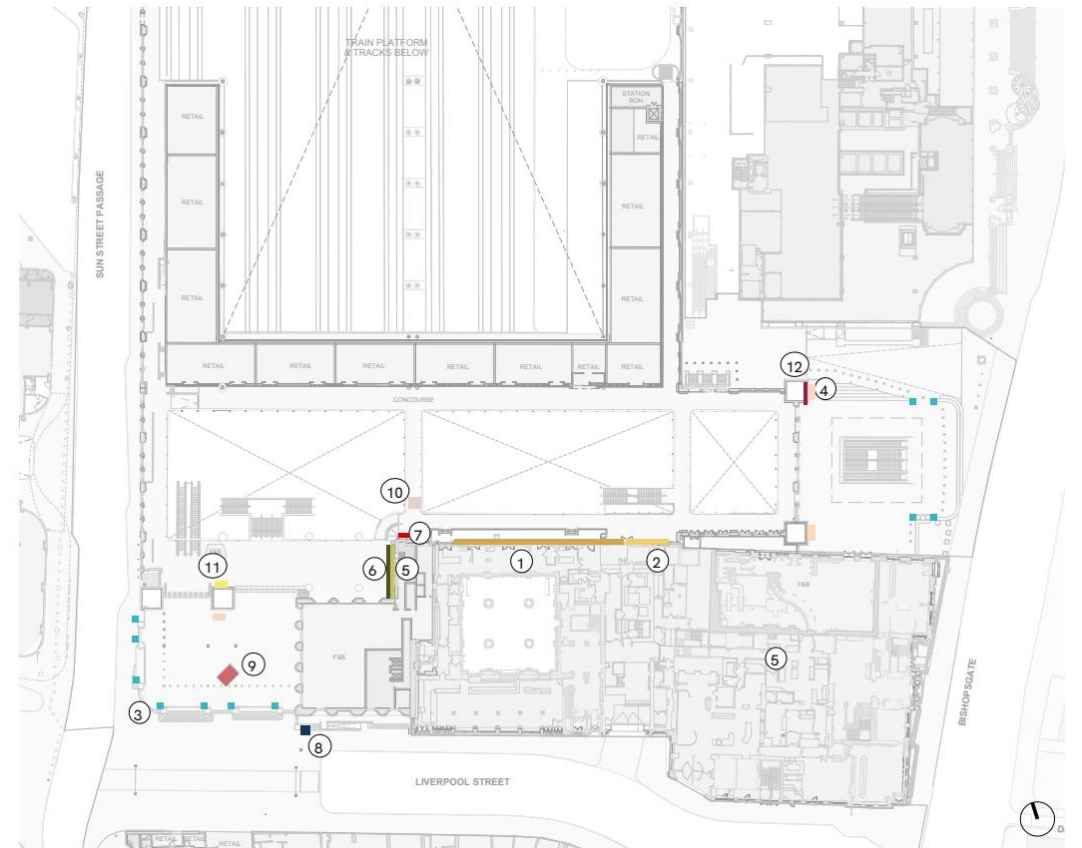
Plan of existing Ground Floor (upper concourse level)
